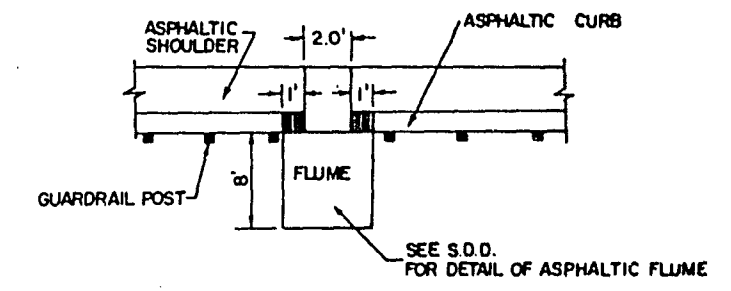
DETAIL FOR ASPHALTIC SHOULDER AT GUARDRAIL
